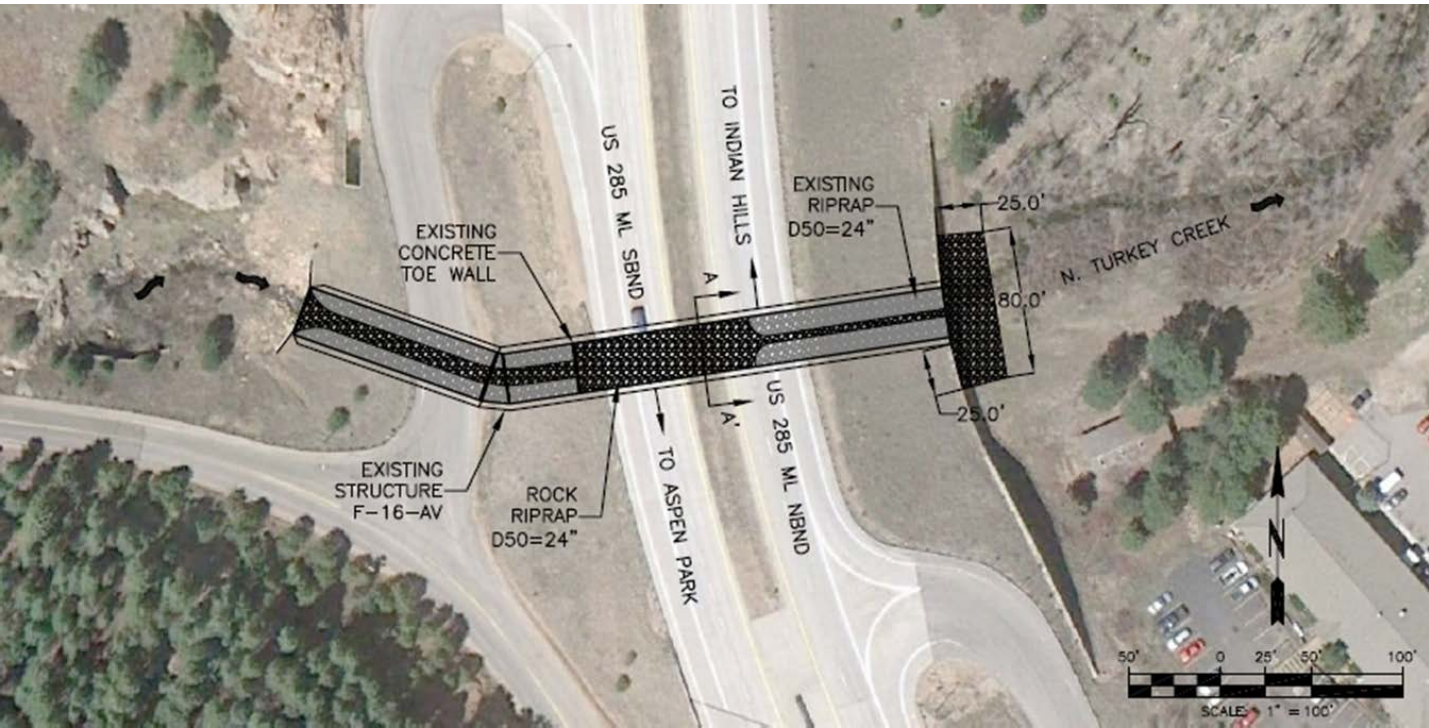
Plan view of Bridge F-16-AV with recommended hydraulic scour countermeasure locations
